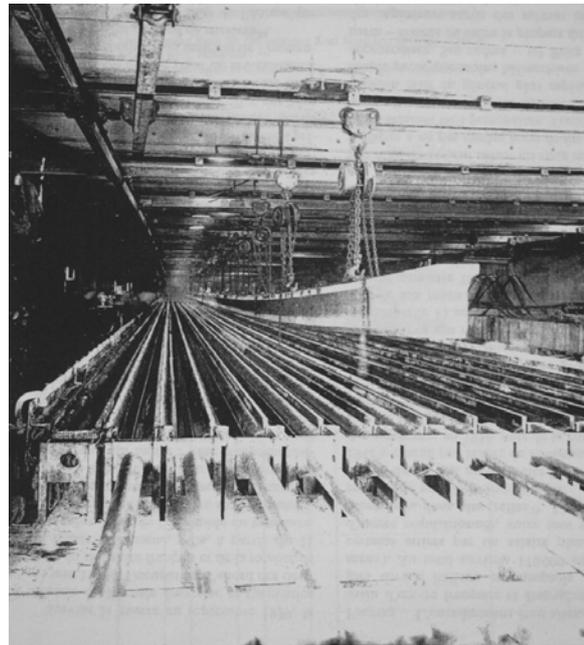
Production line for Ewald Hoyer's divisible prestressed concrete girders precast in 100 m lengths. (Grote and Marrey)
